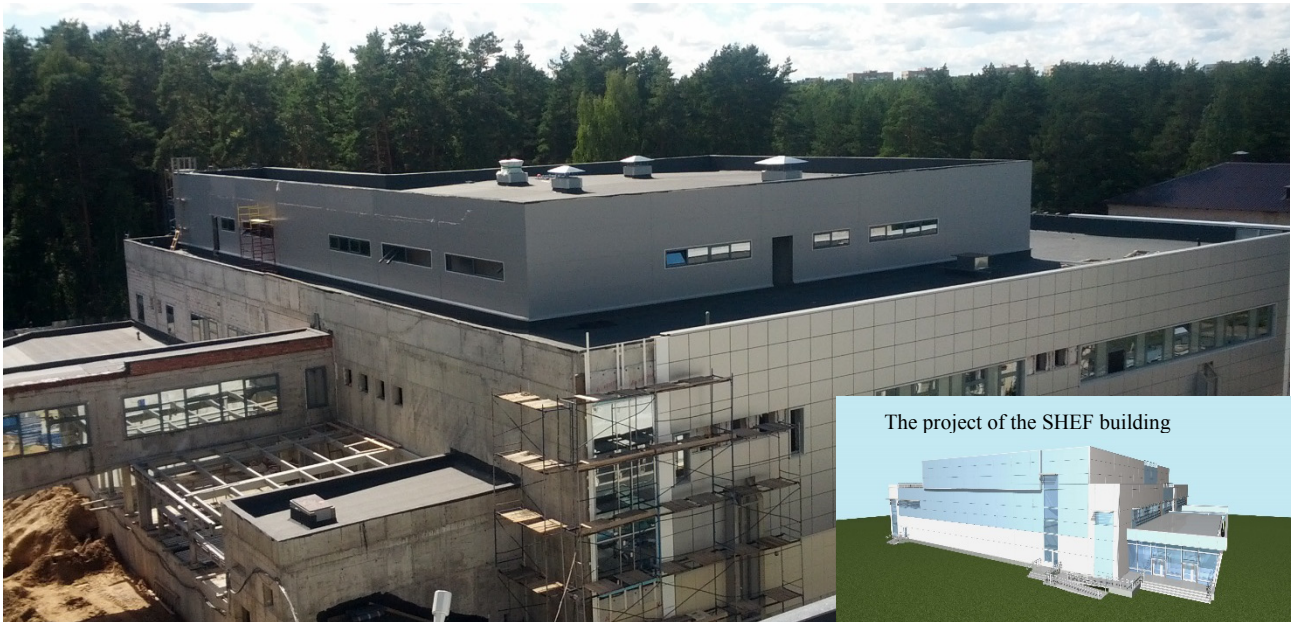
The SHEF building under construction at the Flerov Laboratory. August 2016.
